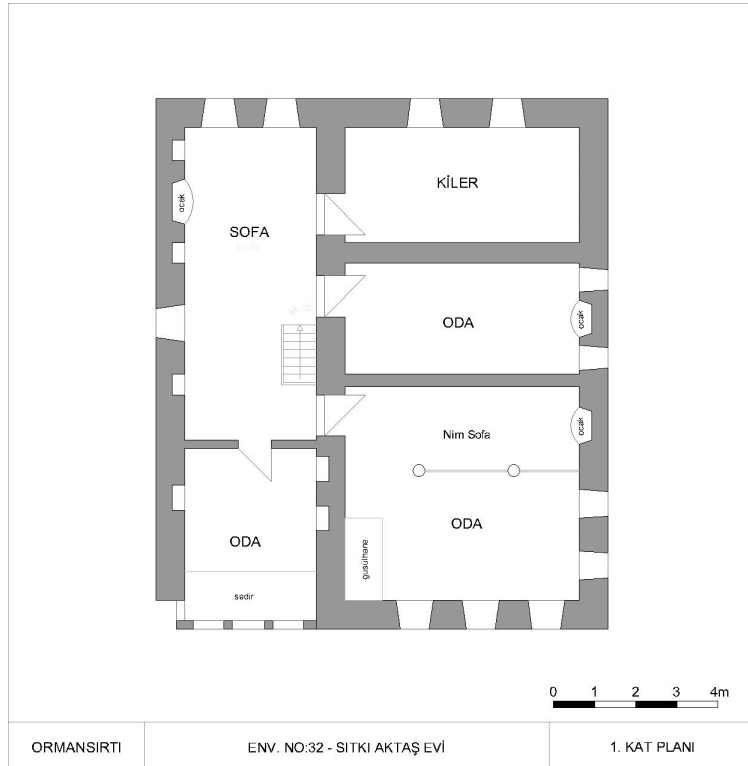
Plan Scheme of Sitki Aktaş House (Ormansırtı Village).
